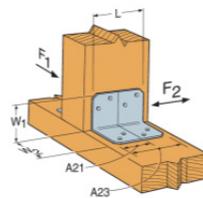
A21 AND A23 ANGLE INSTALLATION DETAIL
